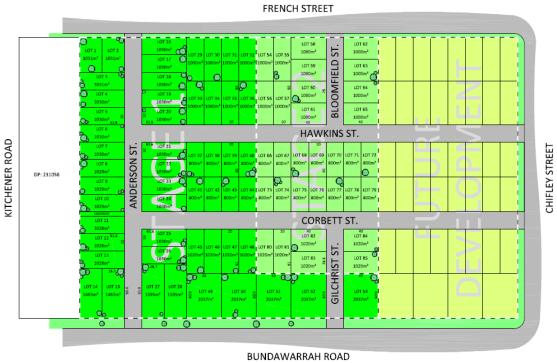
Proposed 85 lot subdivision of R1 General Residential zoned land located adjoining Bundawarrah Road
